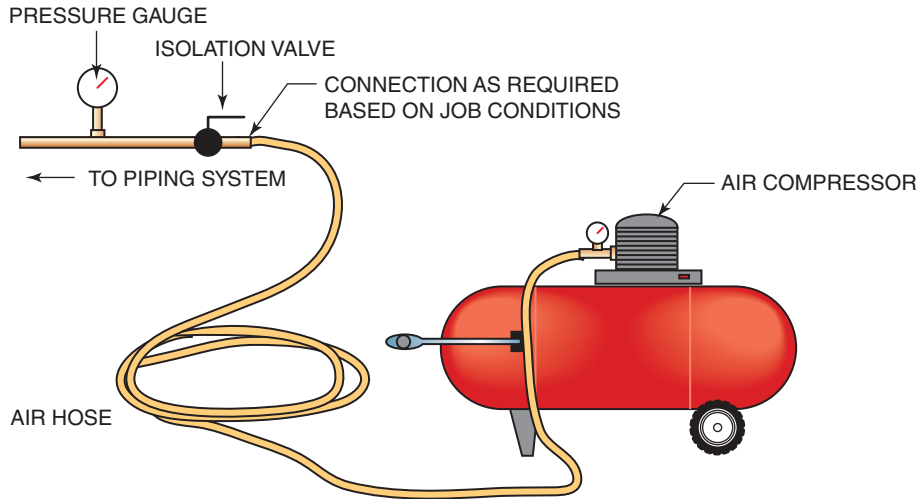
Compressed air test is one method to test a water piping system.
